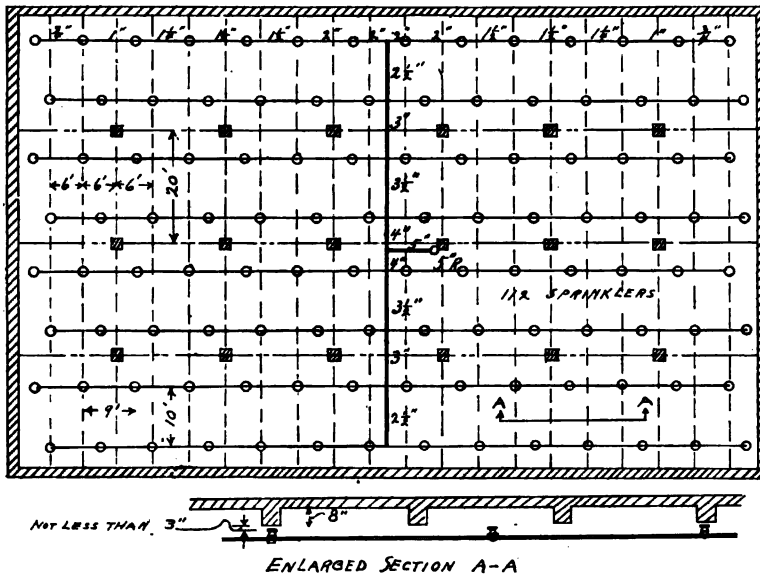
SKETCH SHOWING METHOD OF SPACING SPRINKLER HEADS UNDER FIREPROOF CEILING (BEAM CEILING) WHEN BEAMS ARE NOT OVER 8 INCHES DEEP.
